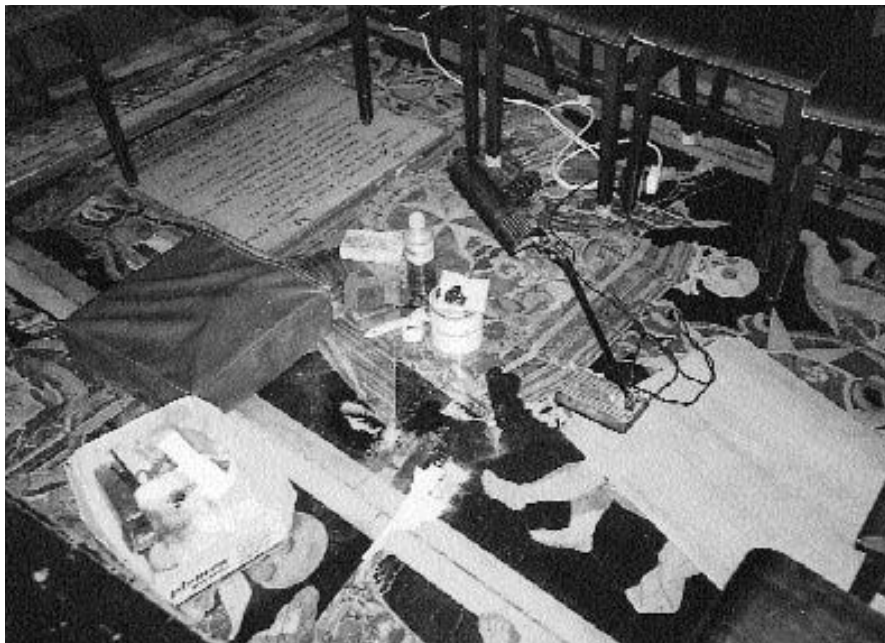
St John's Co-Cathedral, Valetta, Malta. Marble ledger stones to Grand Masters of the Order of St John, damaged by stiletto heels, under repair – see page 128 (Photograph, Ross Dallas)
